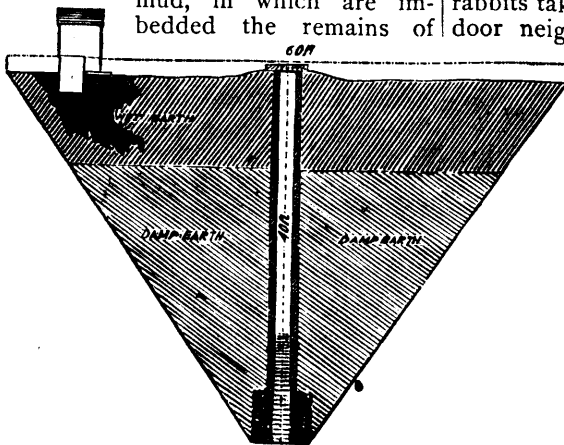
A WELL WITH AN IMPERVIOUS WALL.
